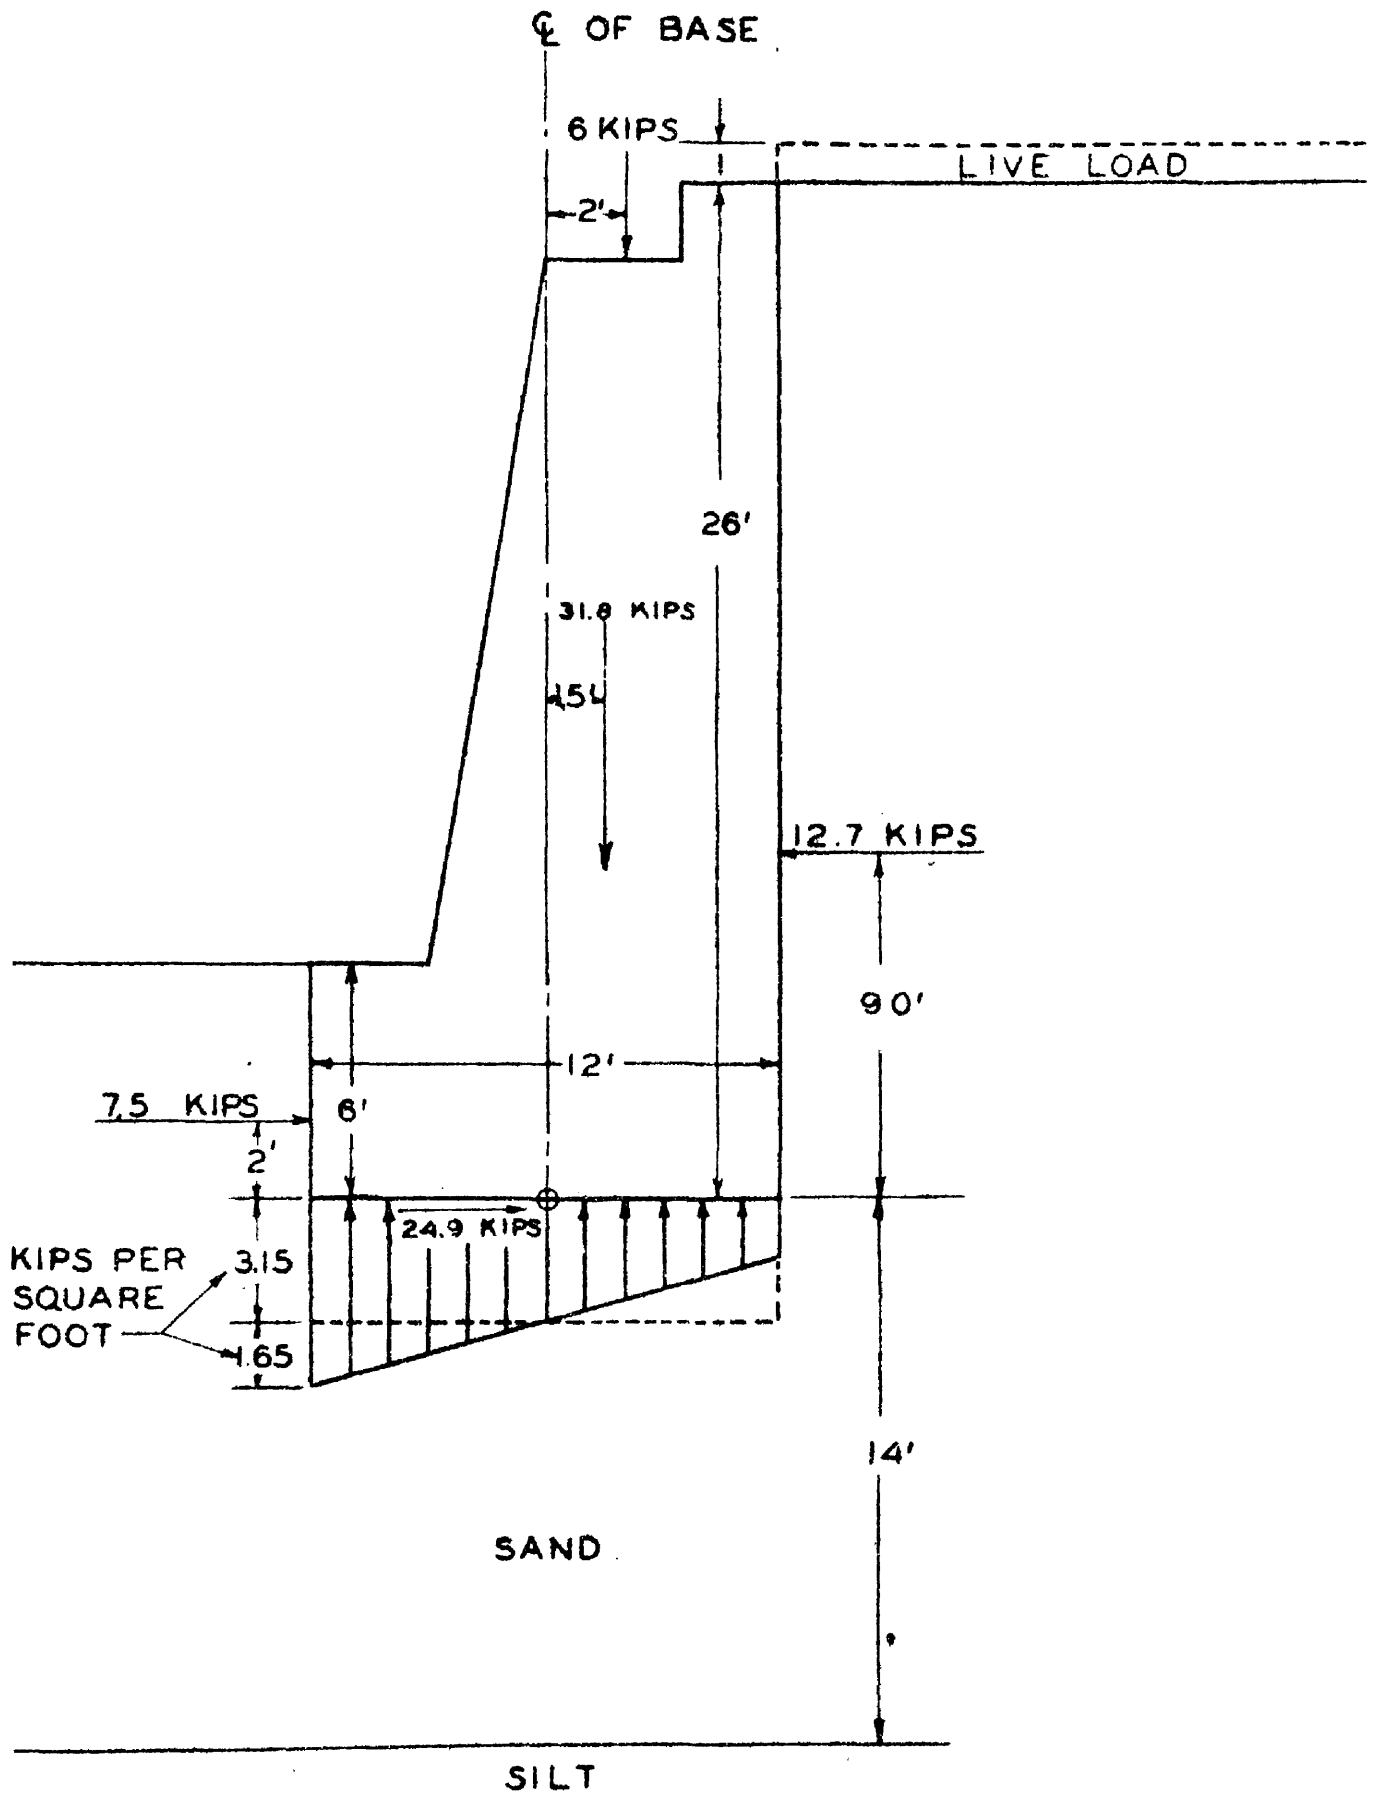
FORCES ON ABUTMENT 30 FEET LONG
